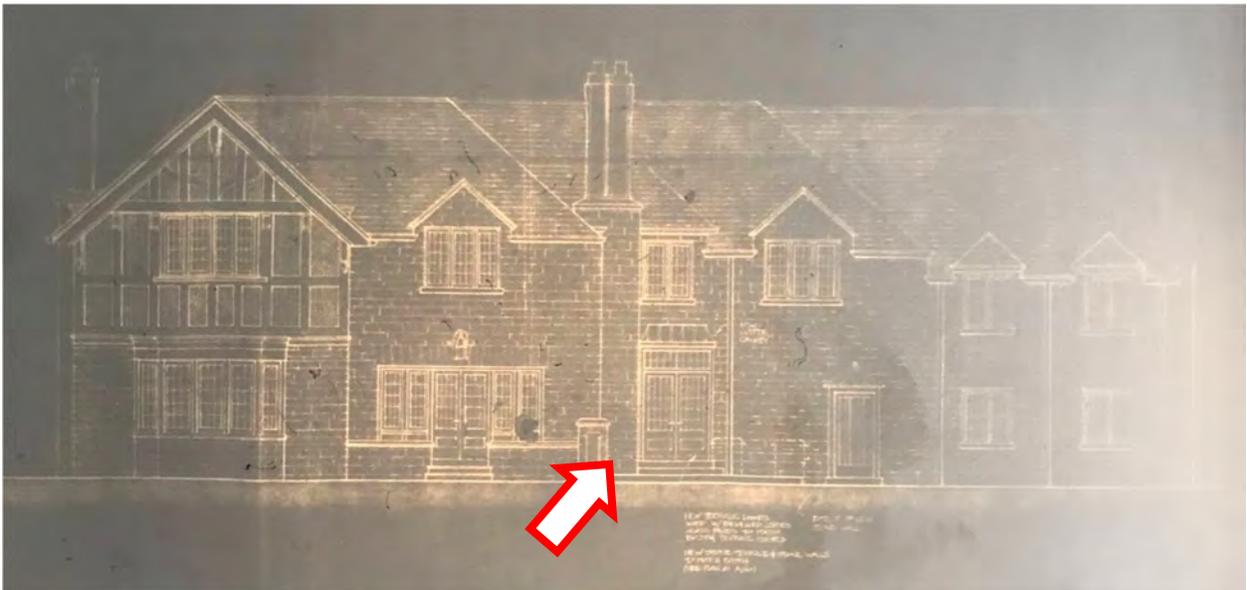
1991 drawing of the south elevation, showing the proposed French door opening and garden terrace extension (Building Records)
